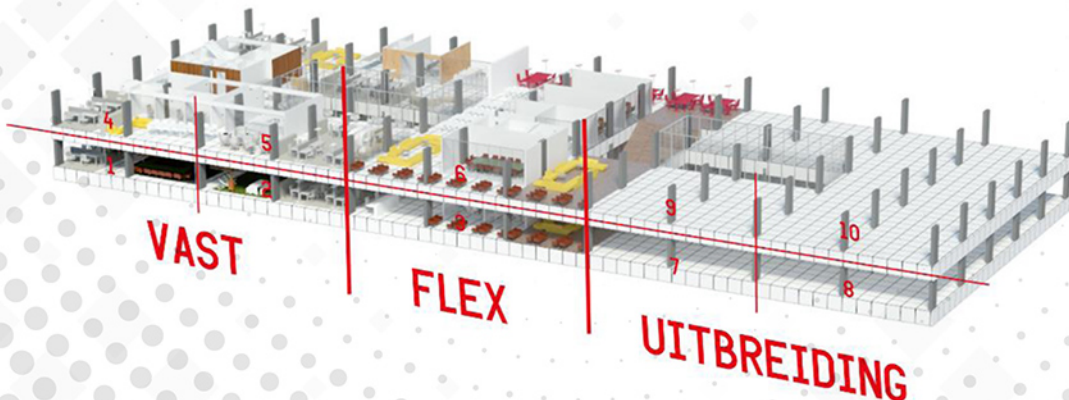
The new office floorplan of Twynstra Gudde (Memelink, 2018).
